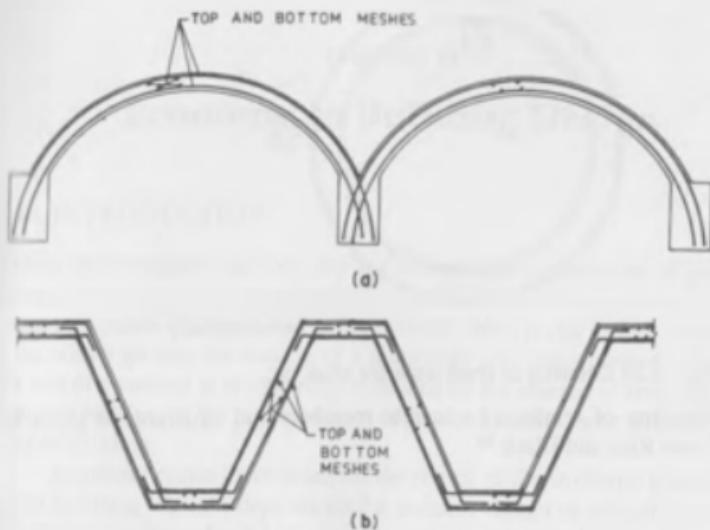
(a) Cylindrical shells; (b) Folded plates.
